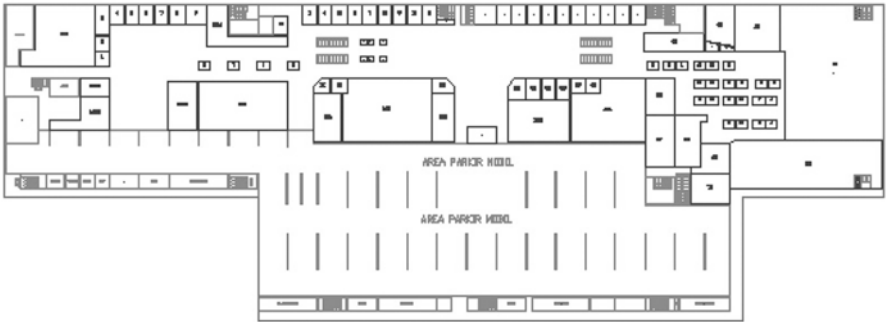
2D building shape of Blok M mall at B2 floor
